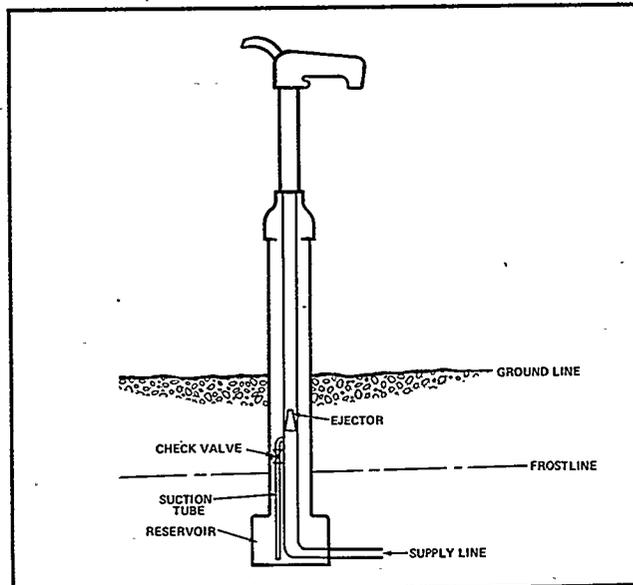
Hydrant that drains the water in the barrel into an internal reservoir. (American Foundry model 126-SC and Woodford model S1.)
